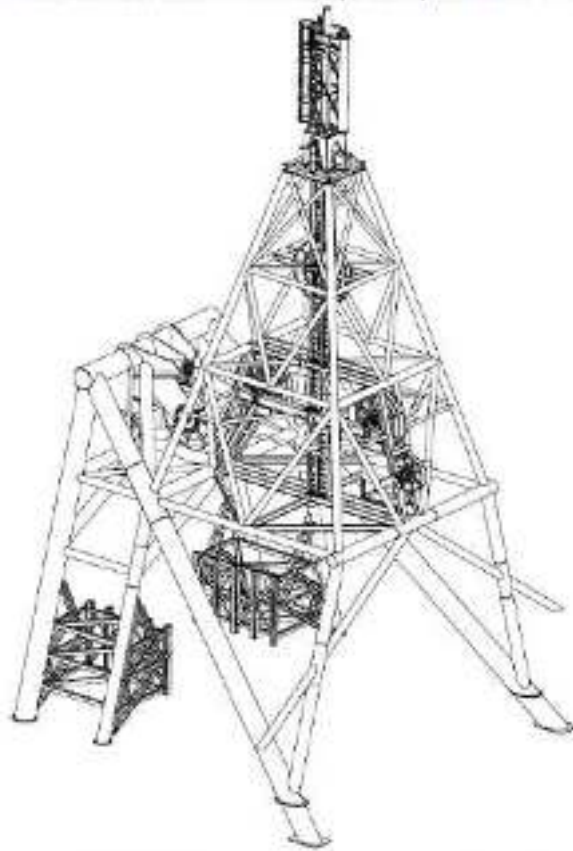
Typical isometric view of an A-Frame and Heave Compensator Tower
